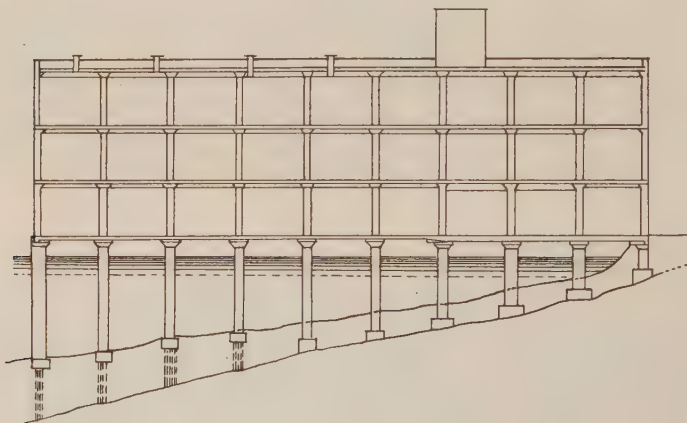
FOUNDATION CONDITIONS FOR NEW BUILDING.
